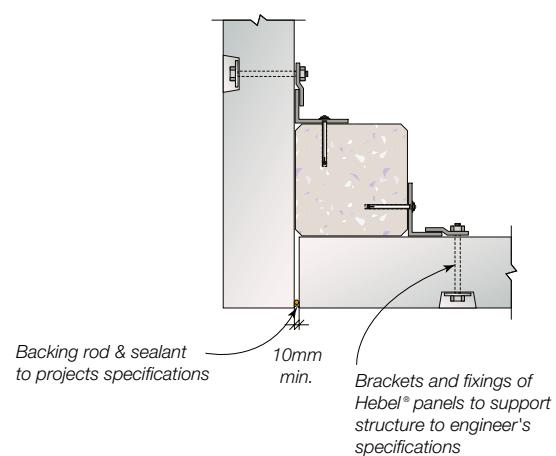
Horizontal wall panel & concrete/masonry support - Tension Tie (plan).
